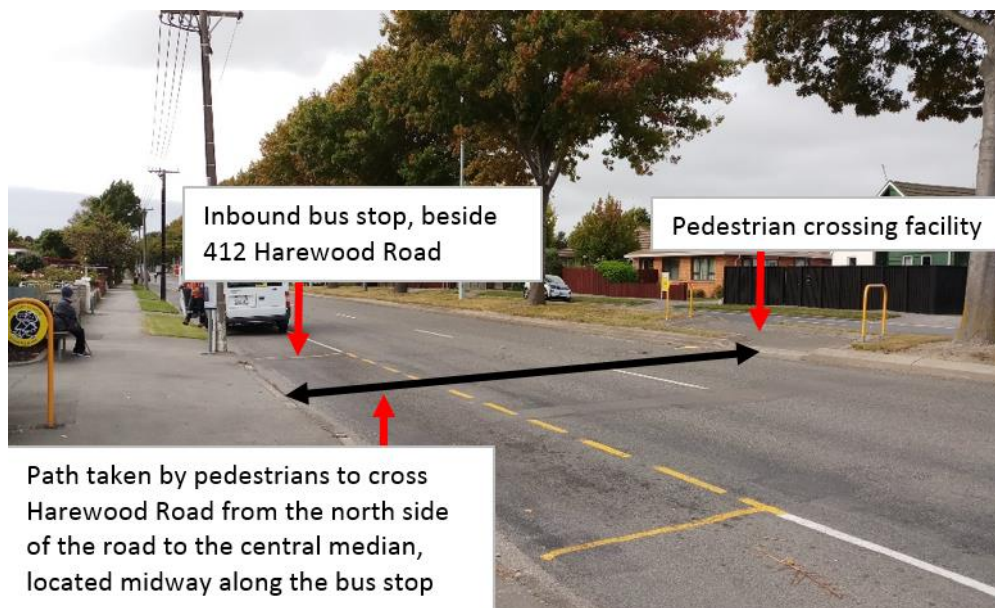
Existing inbound bus stop beside 412 Harewood Road, located across a pedestrian crossing facility
